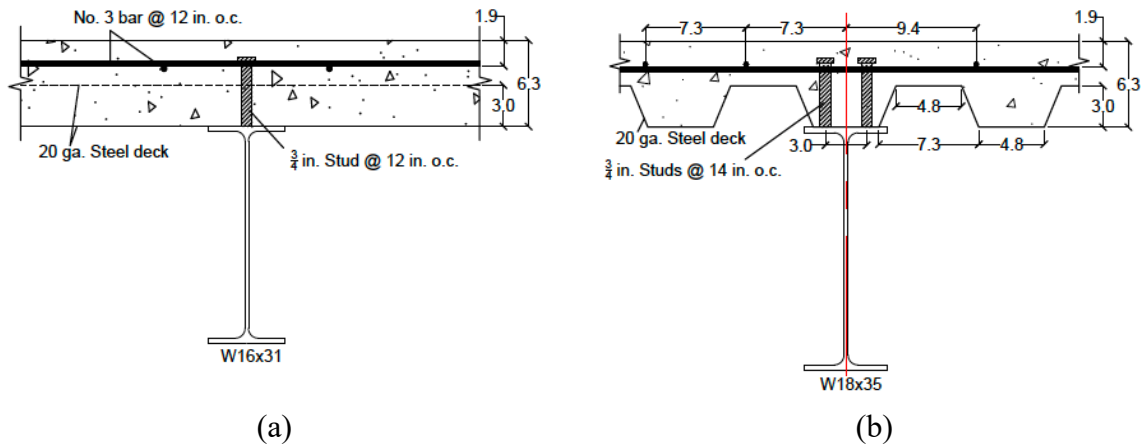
Scale drawings of composite floor beams in the test bay. Dimensions are in inches and rounded to the nearest tenth.
